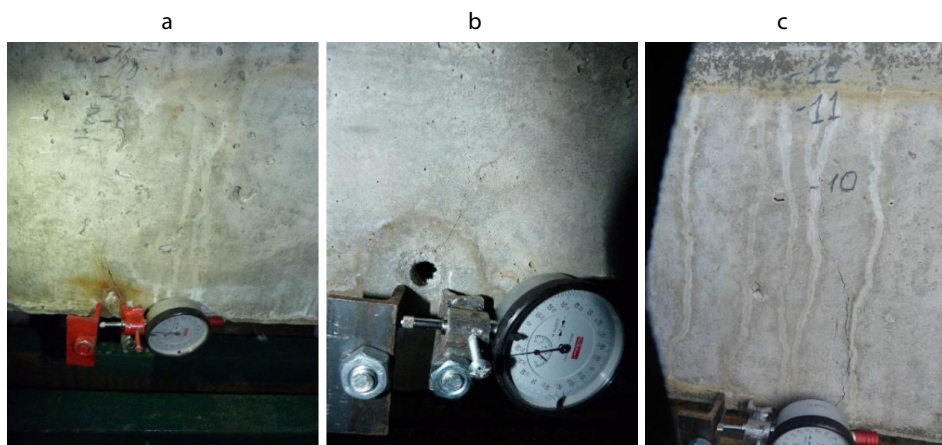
Cracking of beams – with a cross-section bar (a), with a through hole instead of a cross-section bar (b), without a cross-section bar and without a hole (c)
